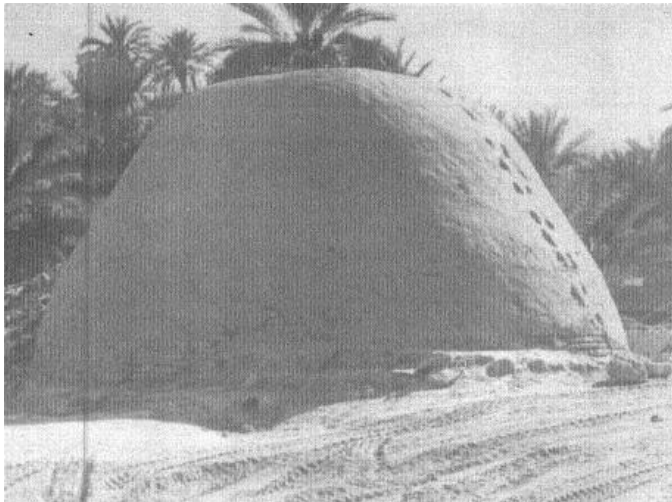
Dome water house built of adobe was not affected by seismic loading.
